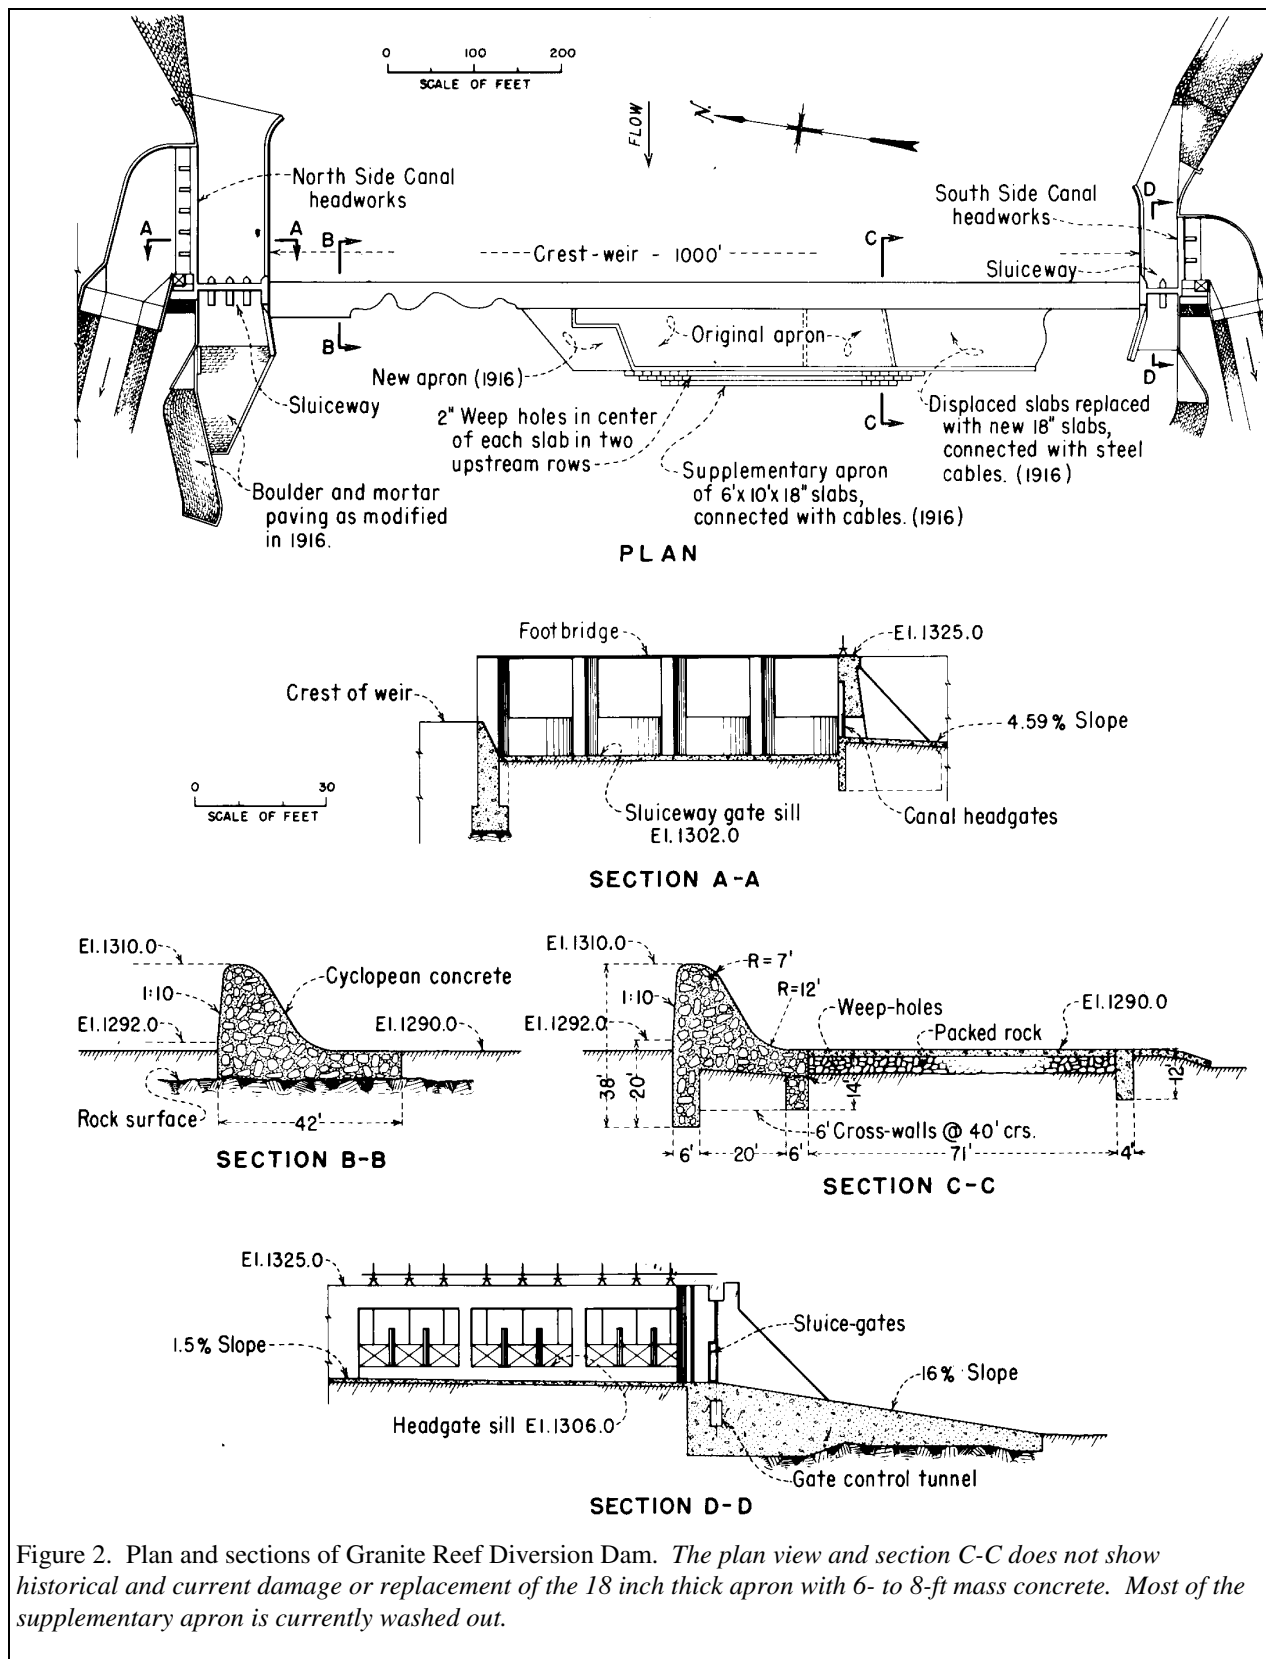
Plan and sections of Granite Reef Diversion Dam. The plan view and section C-C does not show historical and current damage or replacement of the 18 inch thick apron with 6- to 8-ft mass concrete. Most of the supplementary apron is currently washed out.
